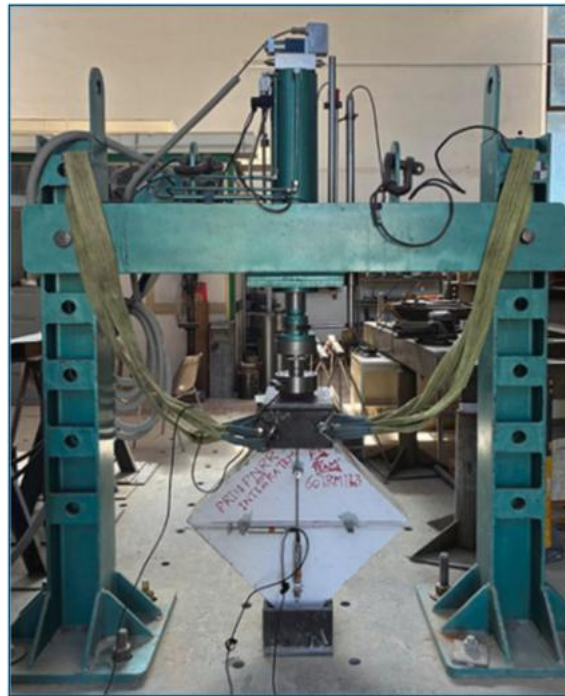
Masonry wall: Specimen-60TRMTL3 for test.
